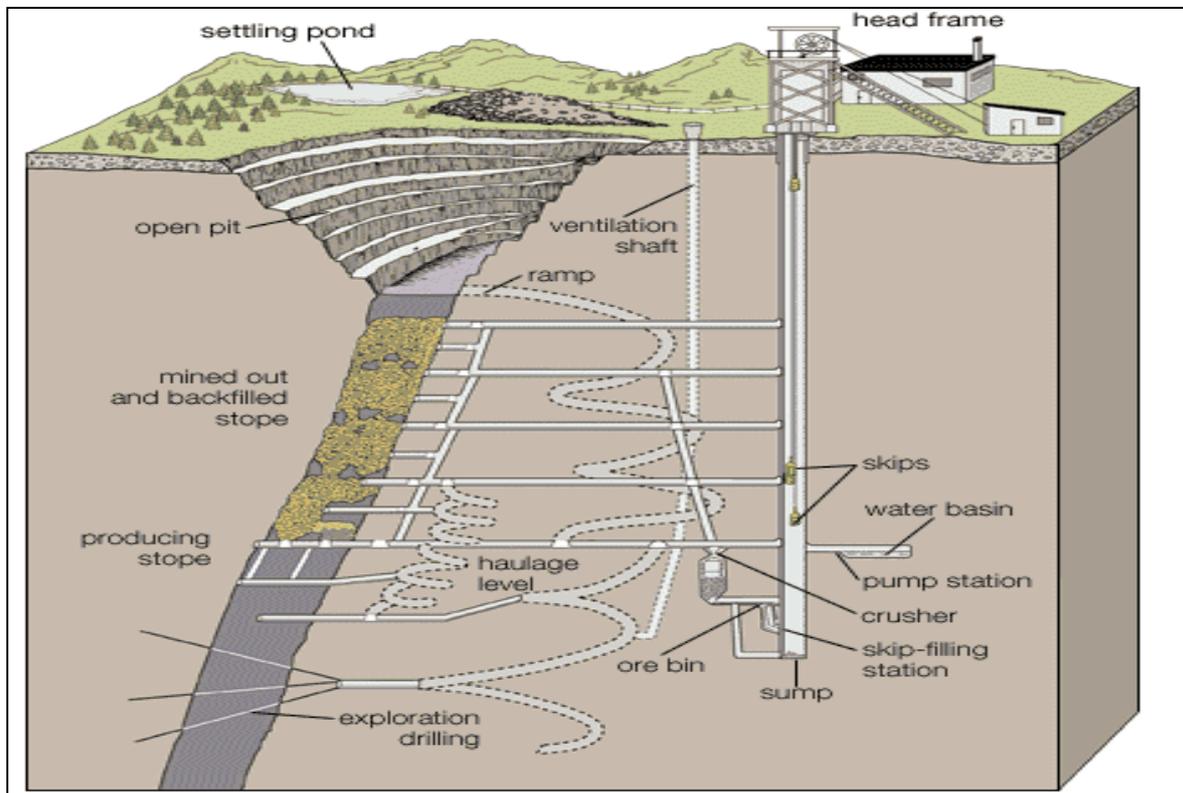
Underground mine workings (adopted from BRGM, 2001).
